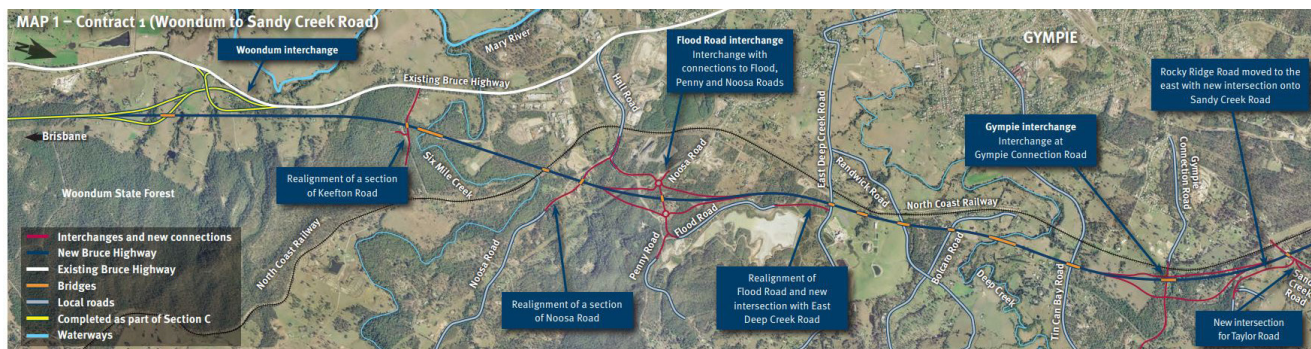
Bruce Highway Upgrade - Woondum to Sandy Creek Road (Source: TMR)
